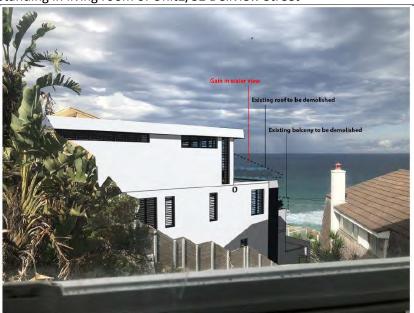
B: Sitting in living room of Unit 2/32 Dellview Street
